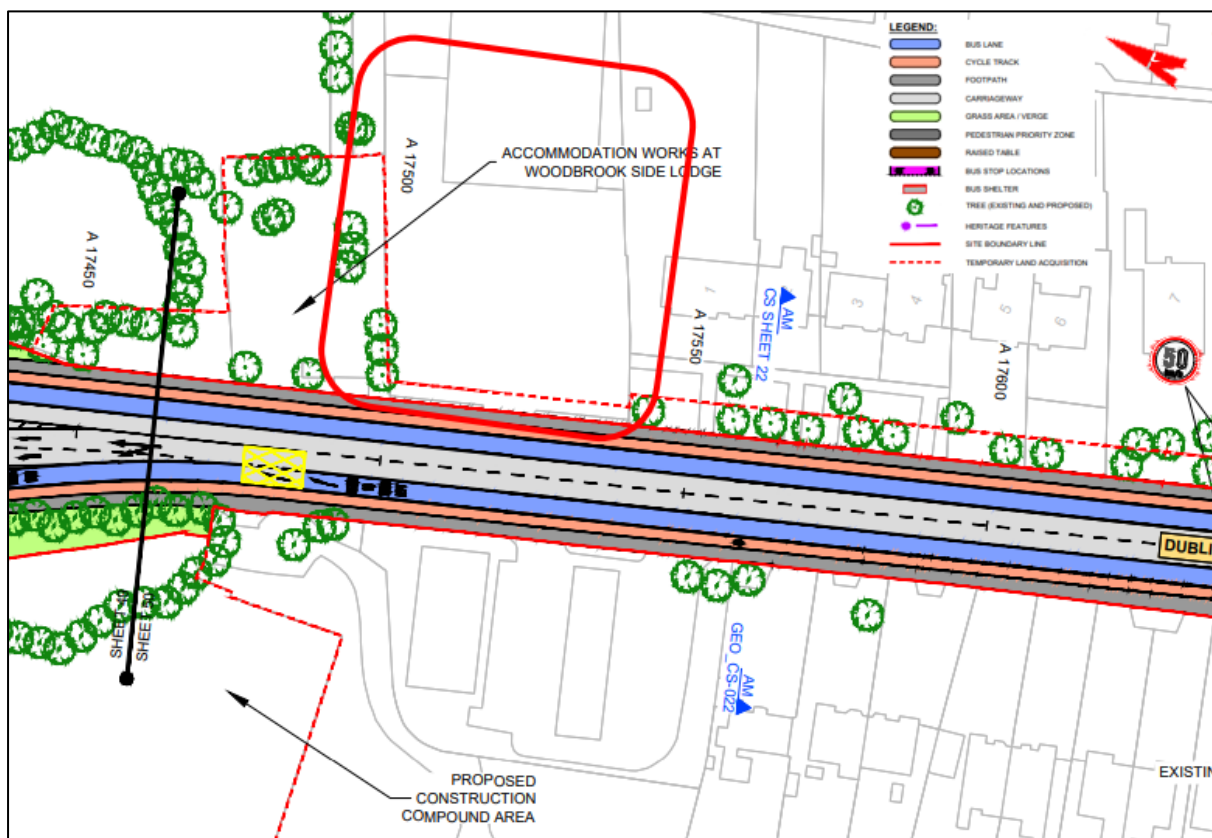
Extract from General Arrangement Drawing at Dublin Road (Sheet 50)
